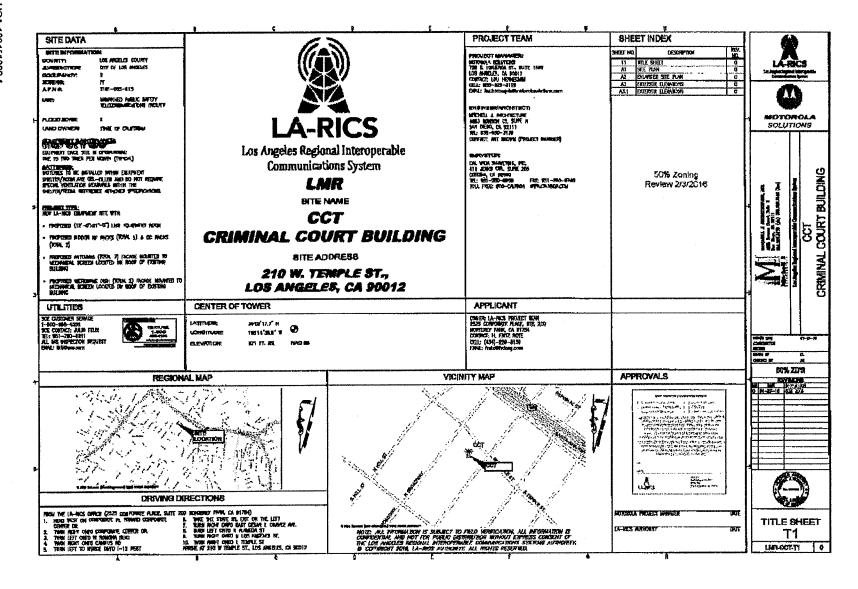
# EXHIBIT C SITE PLAN AND ACCESS ROUTE
